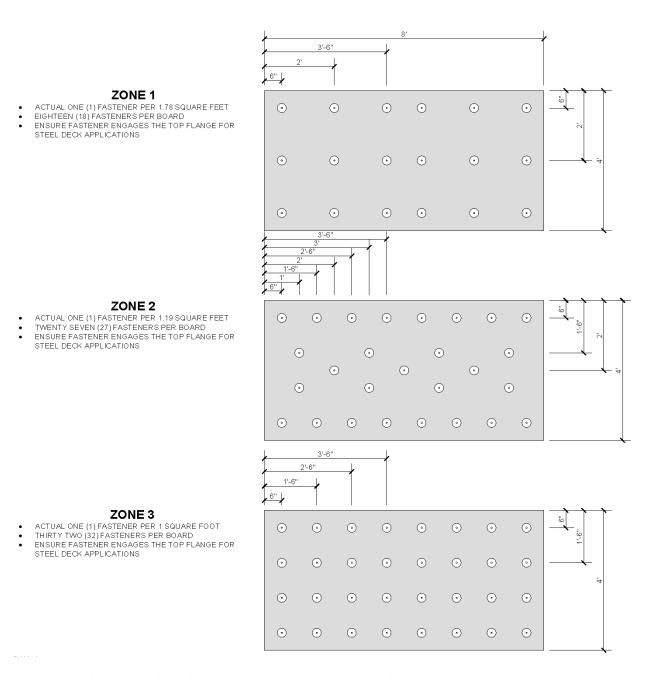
Four Feet by Eight Feet Board, Mechanically Fastened, 1 Fastener Per 1.78 Square Feet Fastening
